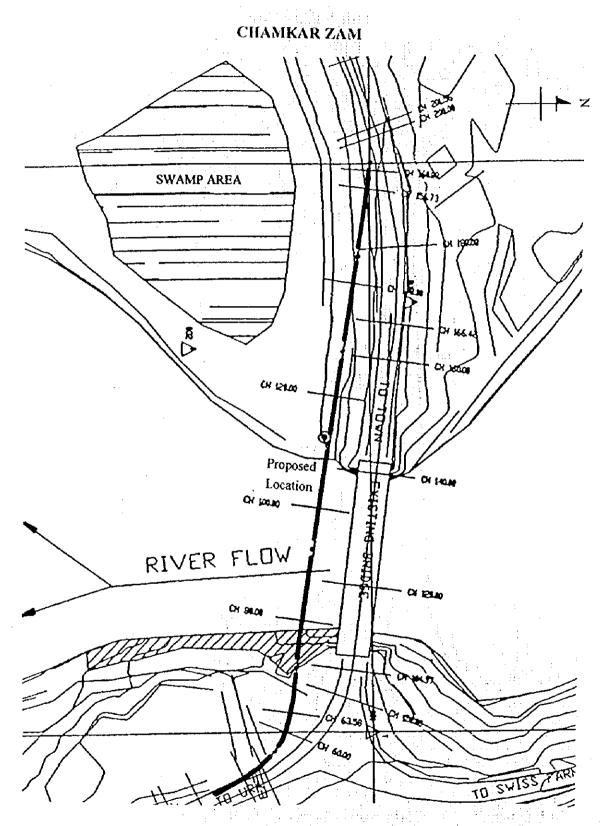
Plan of Alignment Alternatives for Bridge No. 2 Chamkar Zam (Not to scale)
